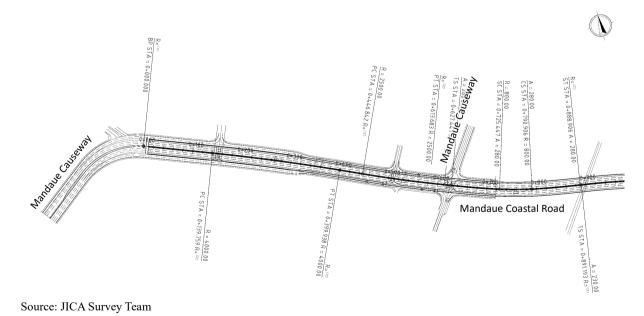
Plan of Beginning Section of Mandaue Coastal Road
